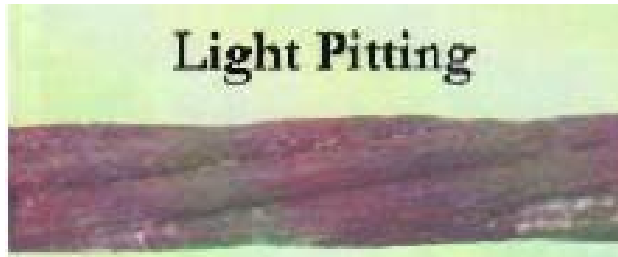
Extensive damage, exposed strands having corrosion with light pitting, Naito et al., 2006
